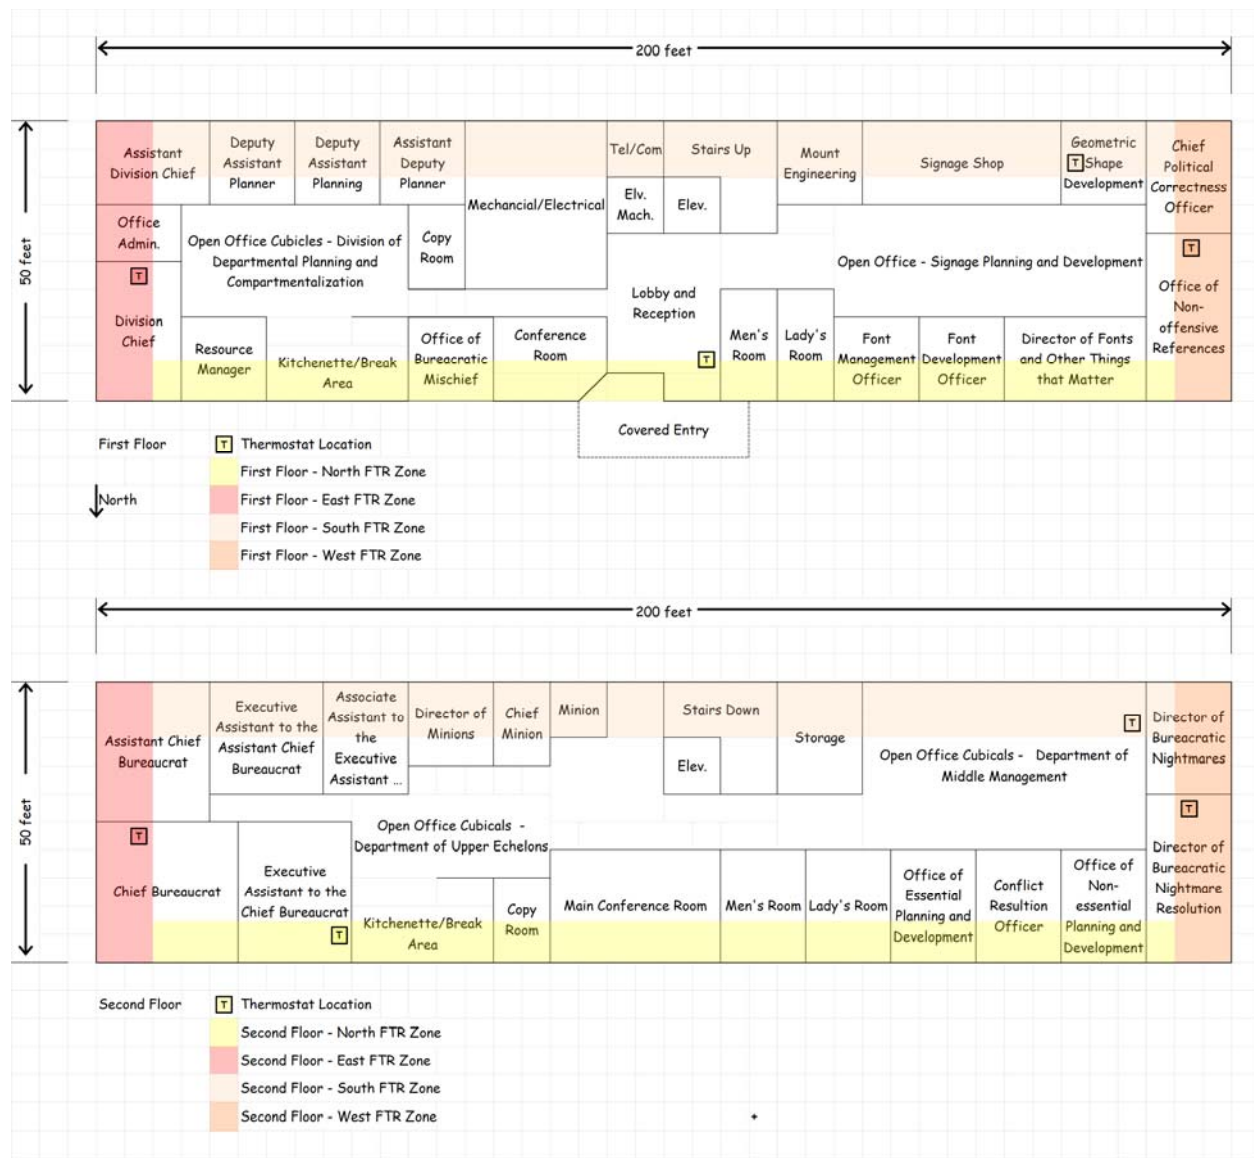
Bureaucratic Affairs Building Floor Plans with FTR Zones
